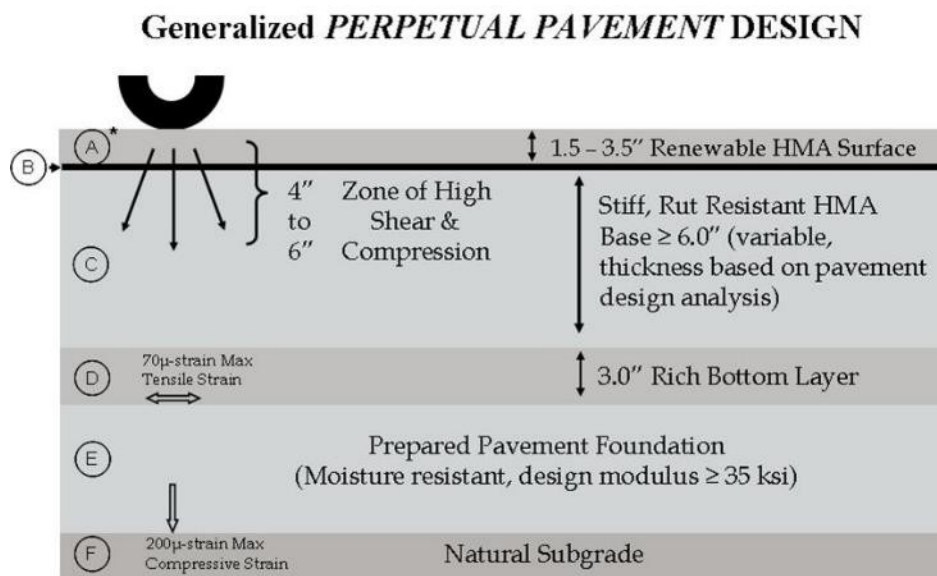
Pavement courses of a perpetual pavement structure.⁵
